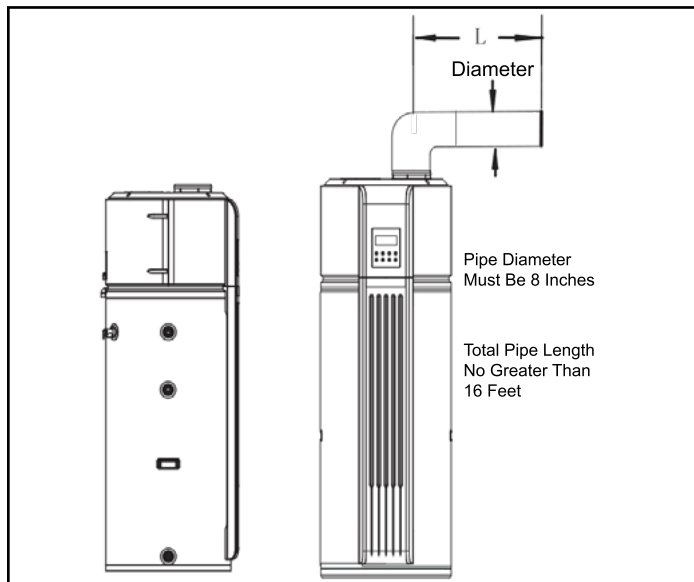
Water Heater with Cool Air Output Adapter Connected to Air Pipe
